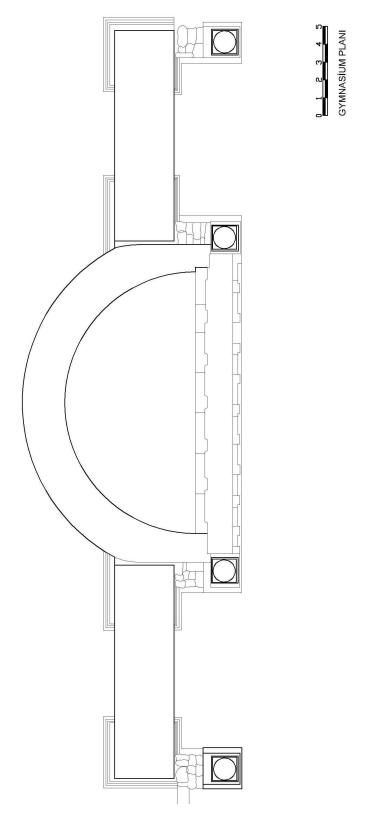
The plan layout of apses of Gymnasium (Archeological excavation reports)
